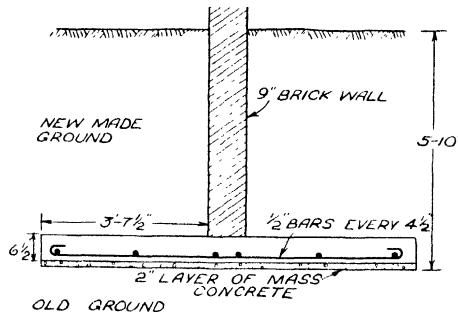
REINFORCED-CONCRETE WALL FOOTING SLAB
